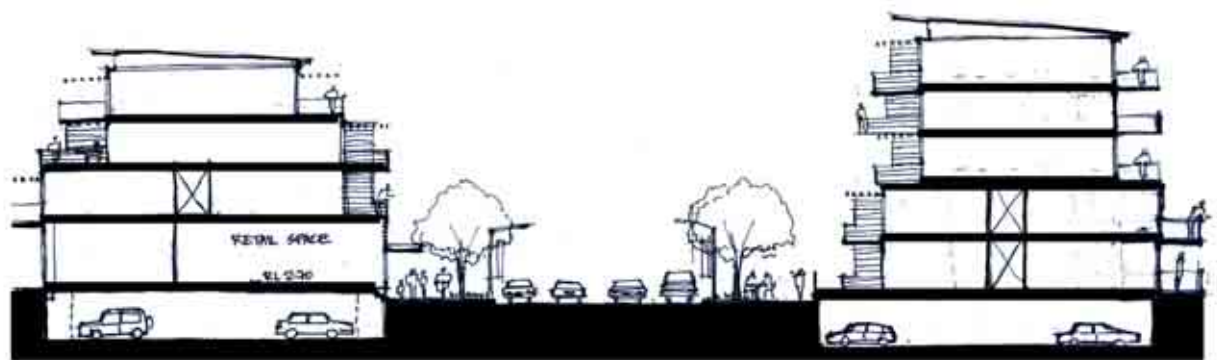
Proposed section through The Entrance Road in the Long Jetty Centre
